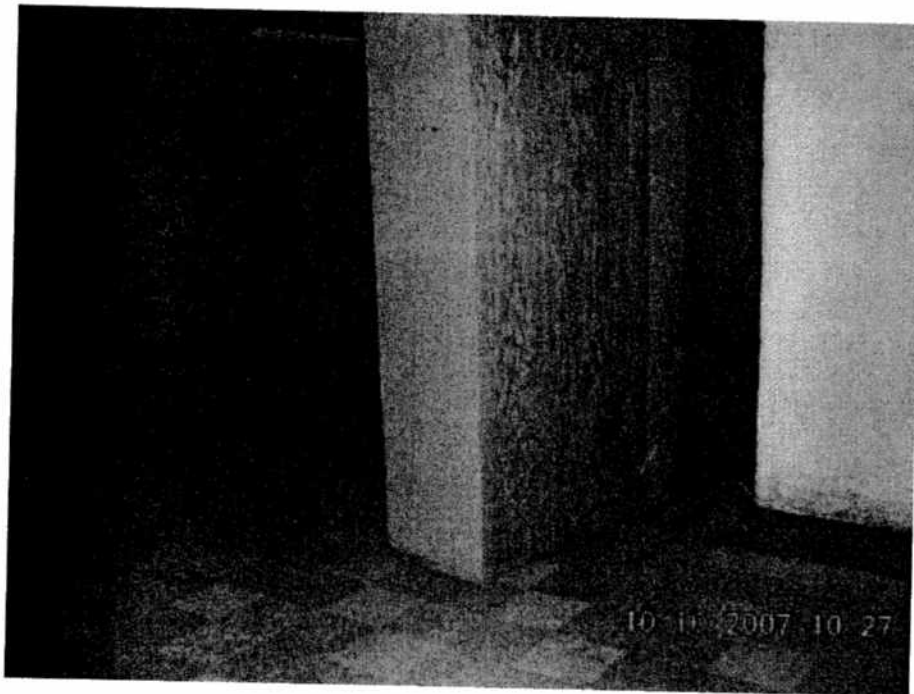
Room located off the main hallway on the west side. Tiles shown are 12”.
